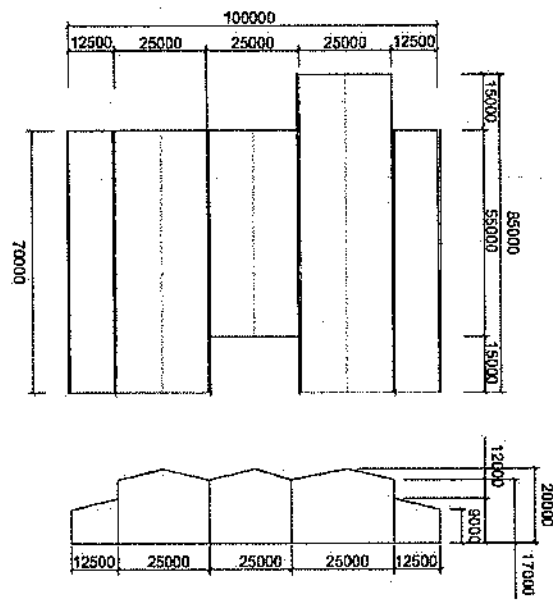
Plan and typical elevation for Shed 1, Shed 2 and Shed 3
